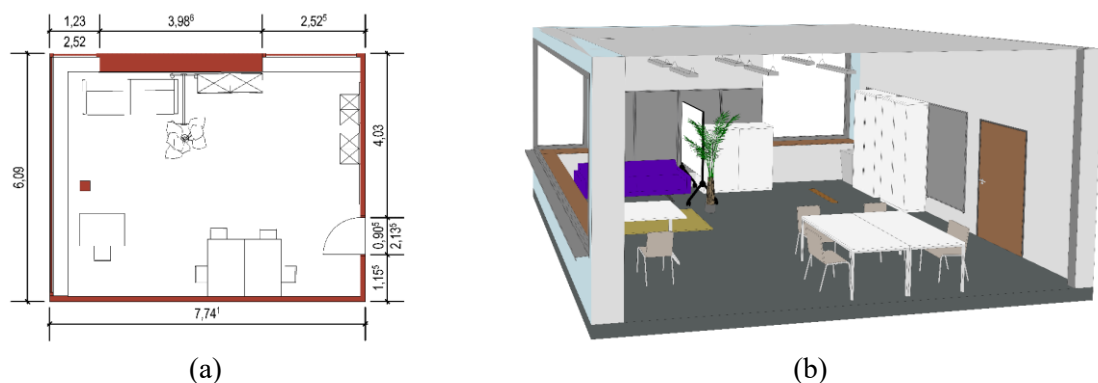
Design of the project environment: floor plan with metric units (a) and modeled as-built BIM (b).
